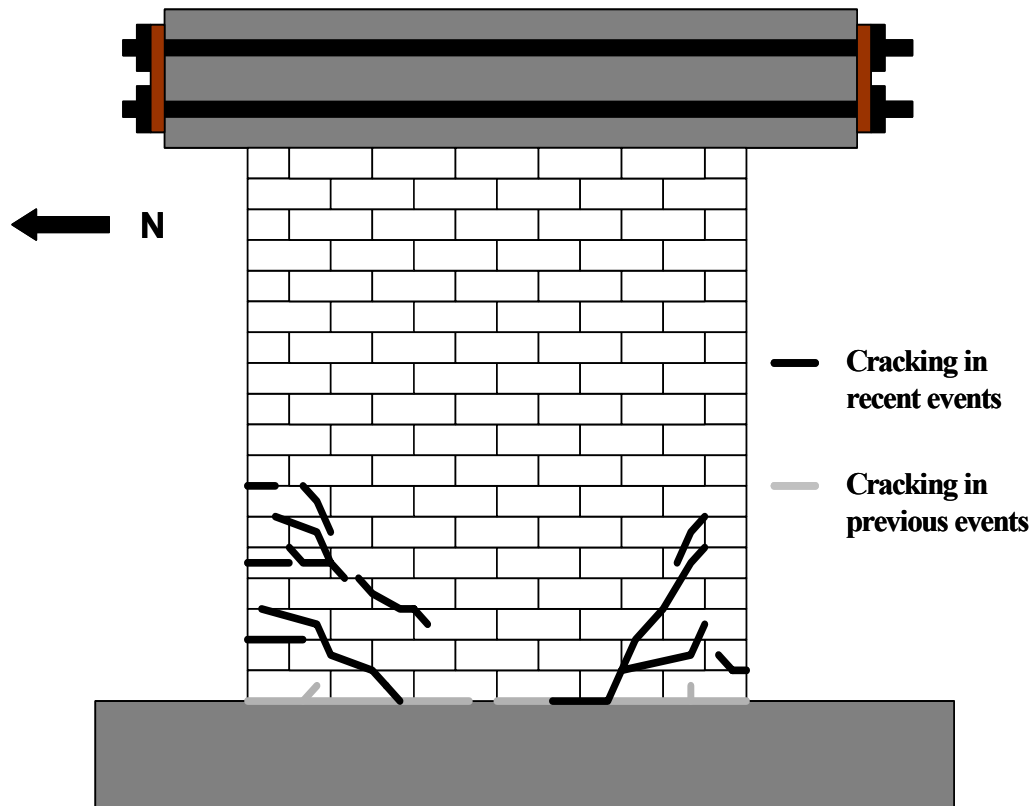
Web-shear cracking at north end of Shear Wall Specimen 18
